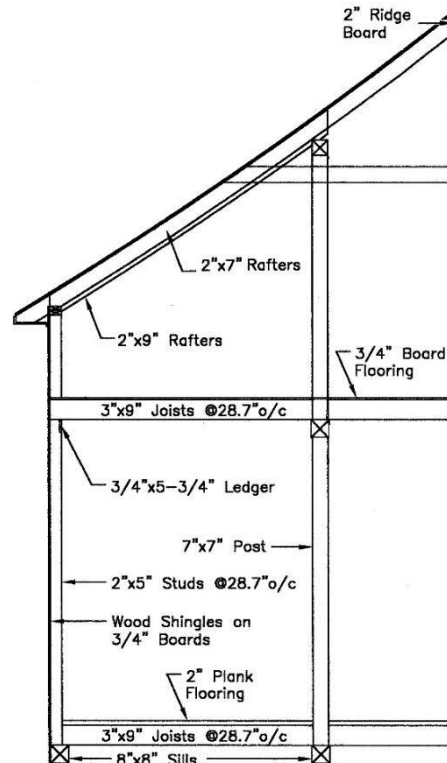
Elevation drawing of Churchill Depot Boarding House. (Courtesy of BPL)
